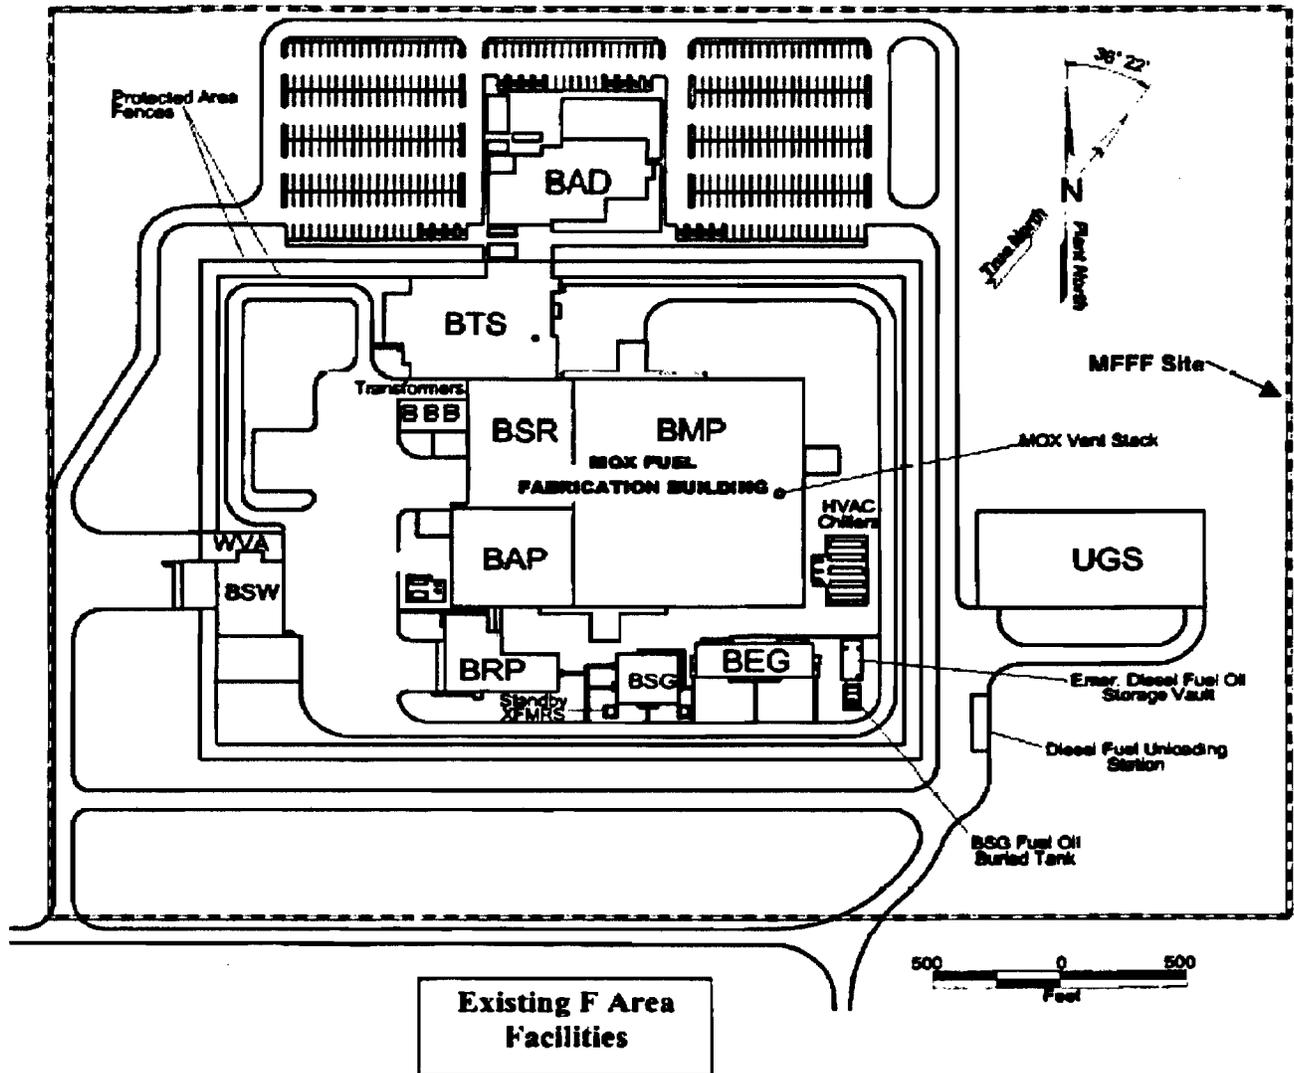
, MFFF Site Layout and the Main Buildings
